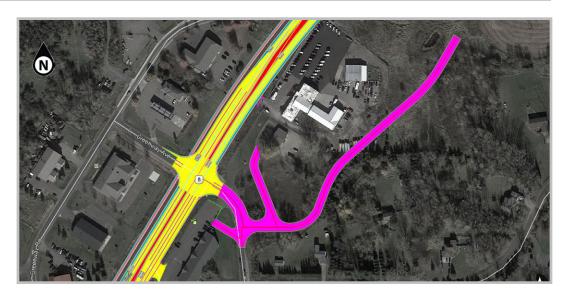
TH 8 and Greenway Ave Intersection (Local Road Improvements)
